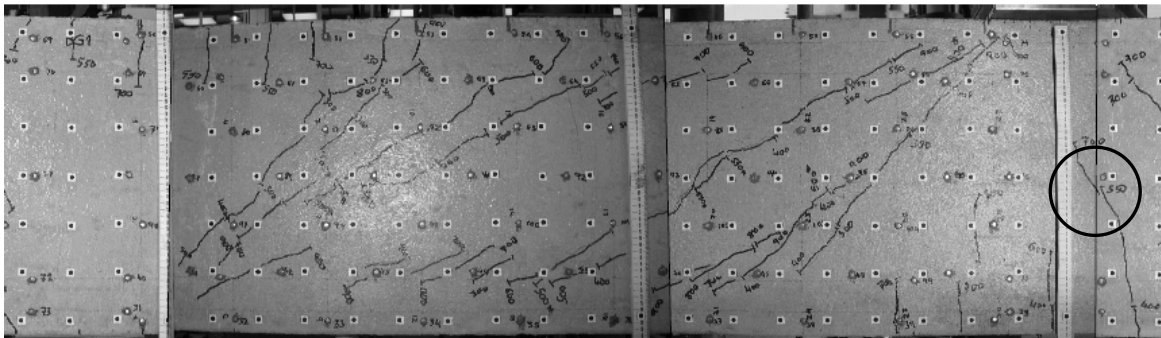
shows the photos taken from the beam test immediately before failure. As explain in next section the position of the cracks had an effect on Demec readings.
